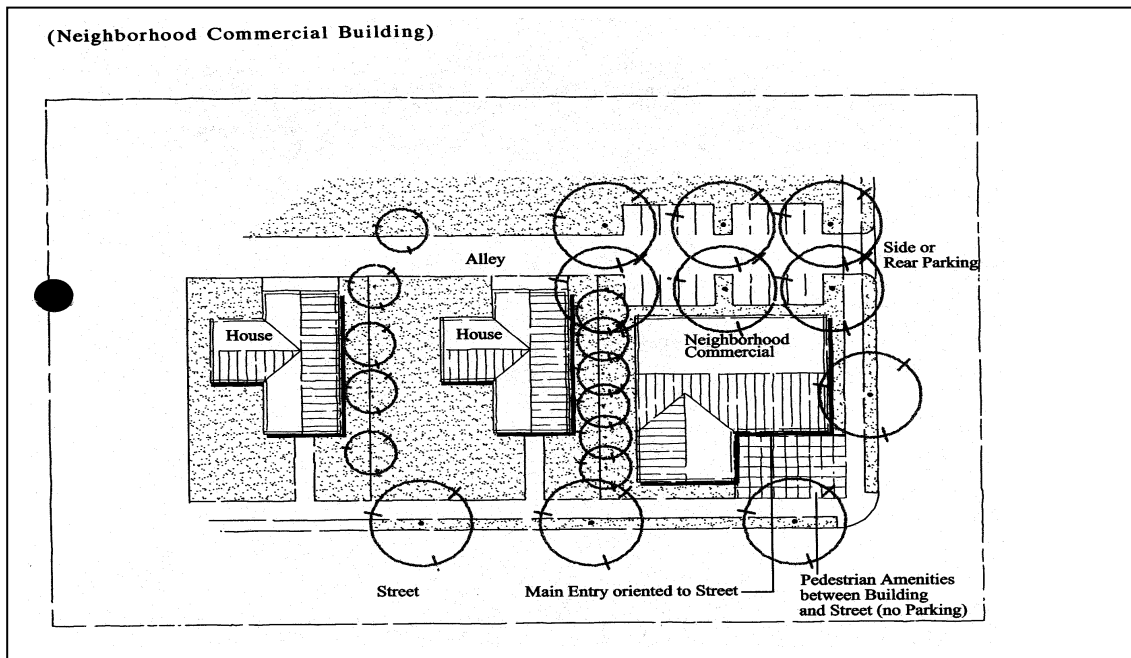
B – Typical Building Orientation – Neighborhood Commercial Building
